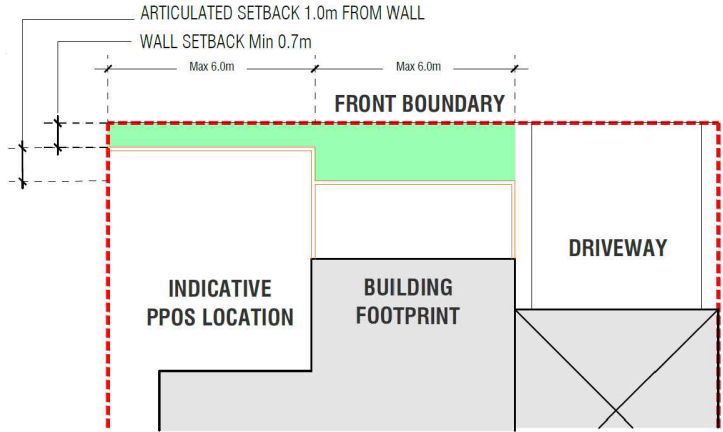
EXAMPLE - COURTYARD WALL, SHOWING ARTICULATED PLANTING ZONE SETBACK
